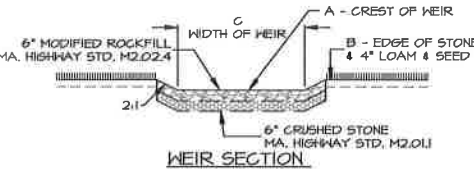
### DETAIL - INFILTRATION BASIN NO. 1 OUTLET WEIR
